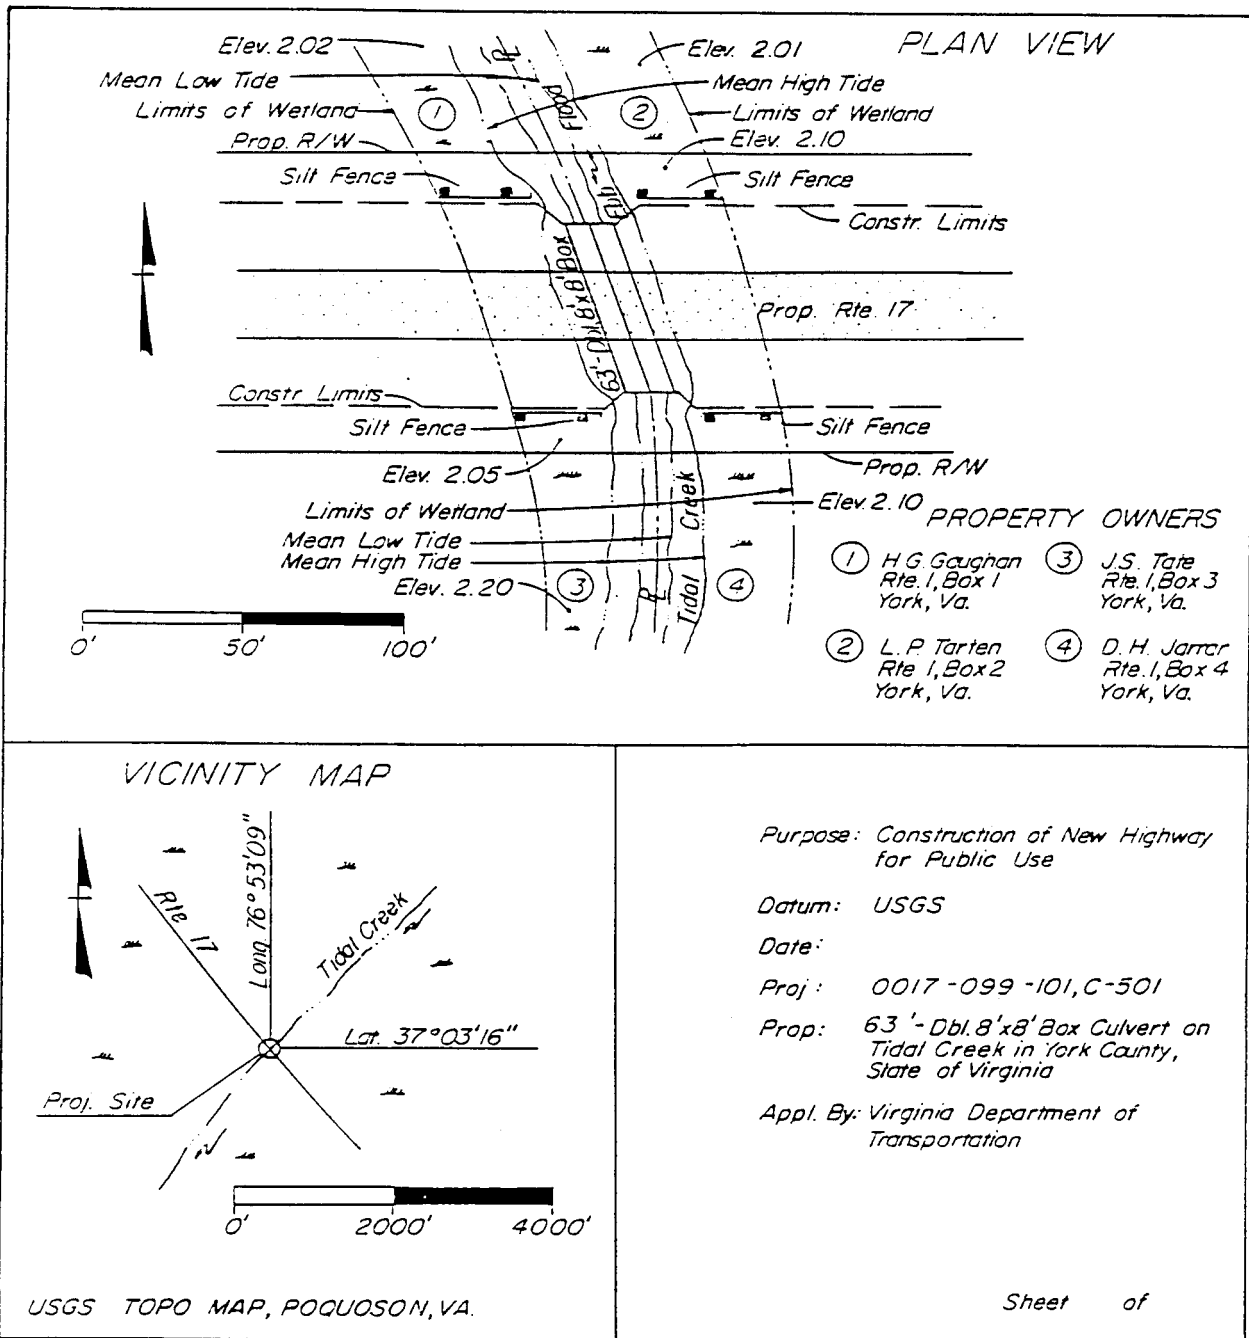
CULVERT (TIDAL)-PLAN VIEW
